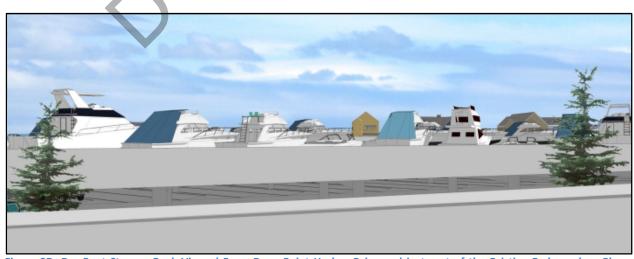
D: Dry Boat Storage Deck Viewed From Dana Point Harbor Drive and just east of the Existing Embarcadero Place Intersection
